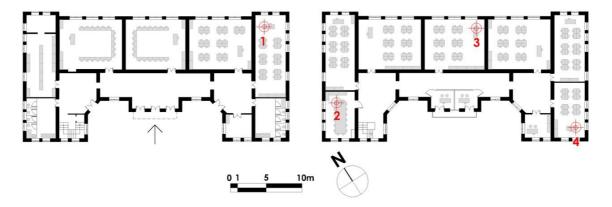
Building plans and dataloggers locations (ground floor on the left and first floor on the right).
